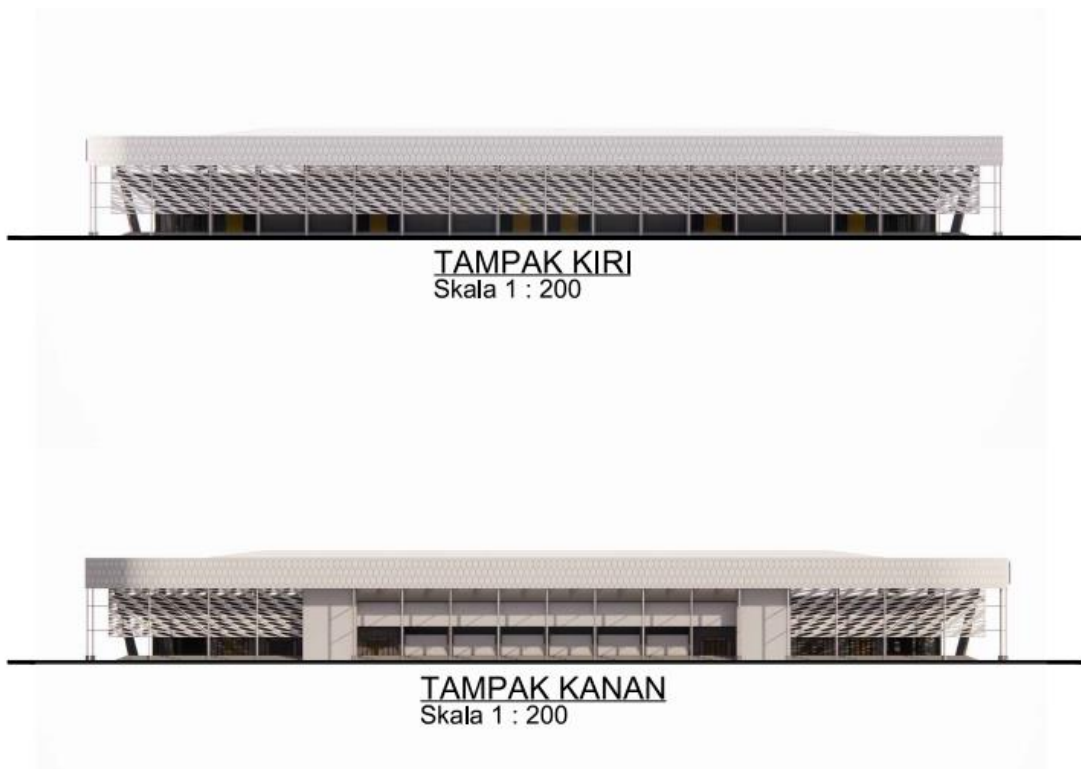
(a) Left Elevation; (b) Right Elevation. (Source: Author,2024)
